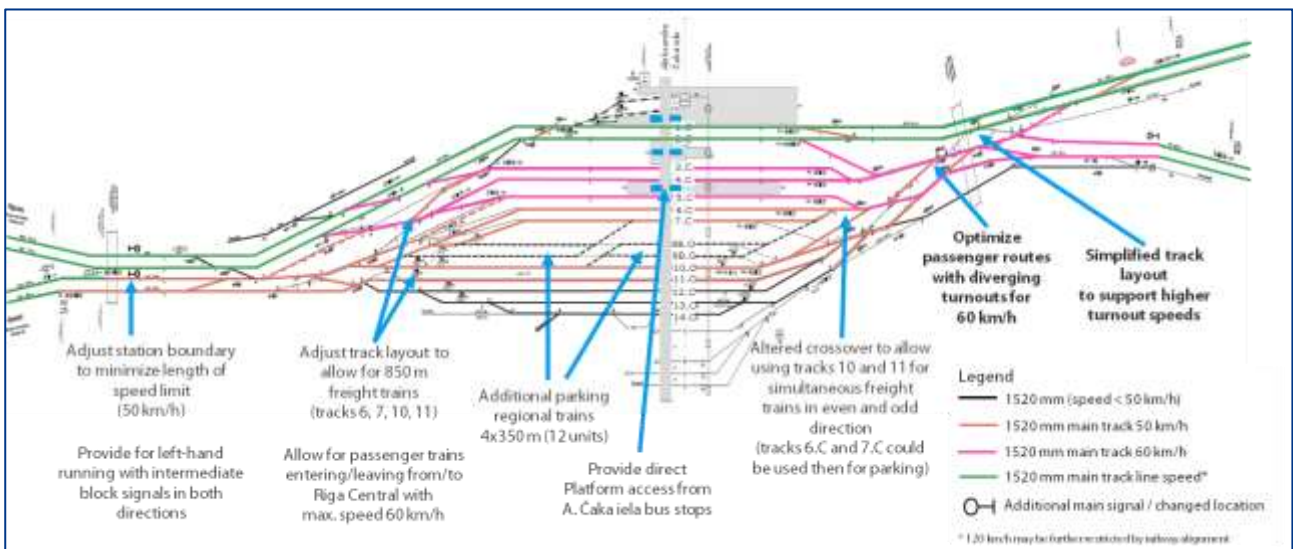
PROPOSED TRACK LAYOUT ZEMITĀNI STATION – VARIANT 2
